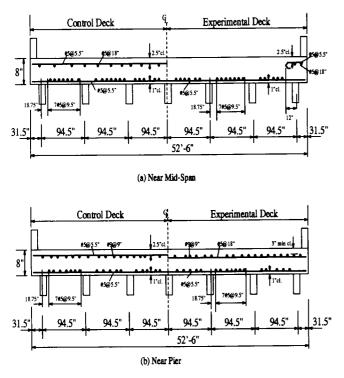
Reinforcing steel details for the bridge deck (not to scale; 1 in. = 25.4 mm).
